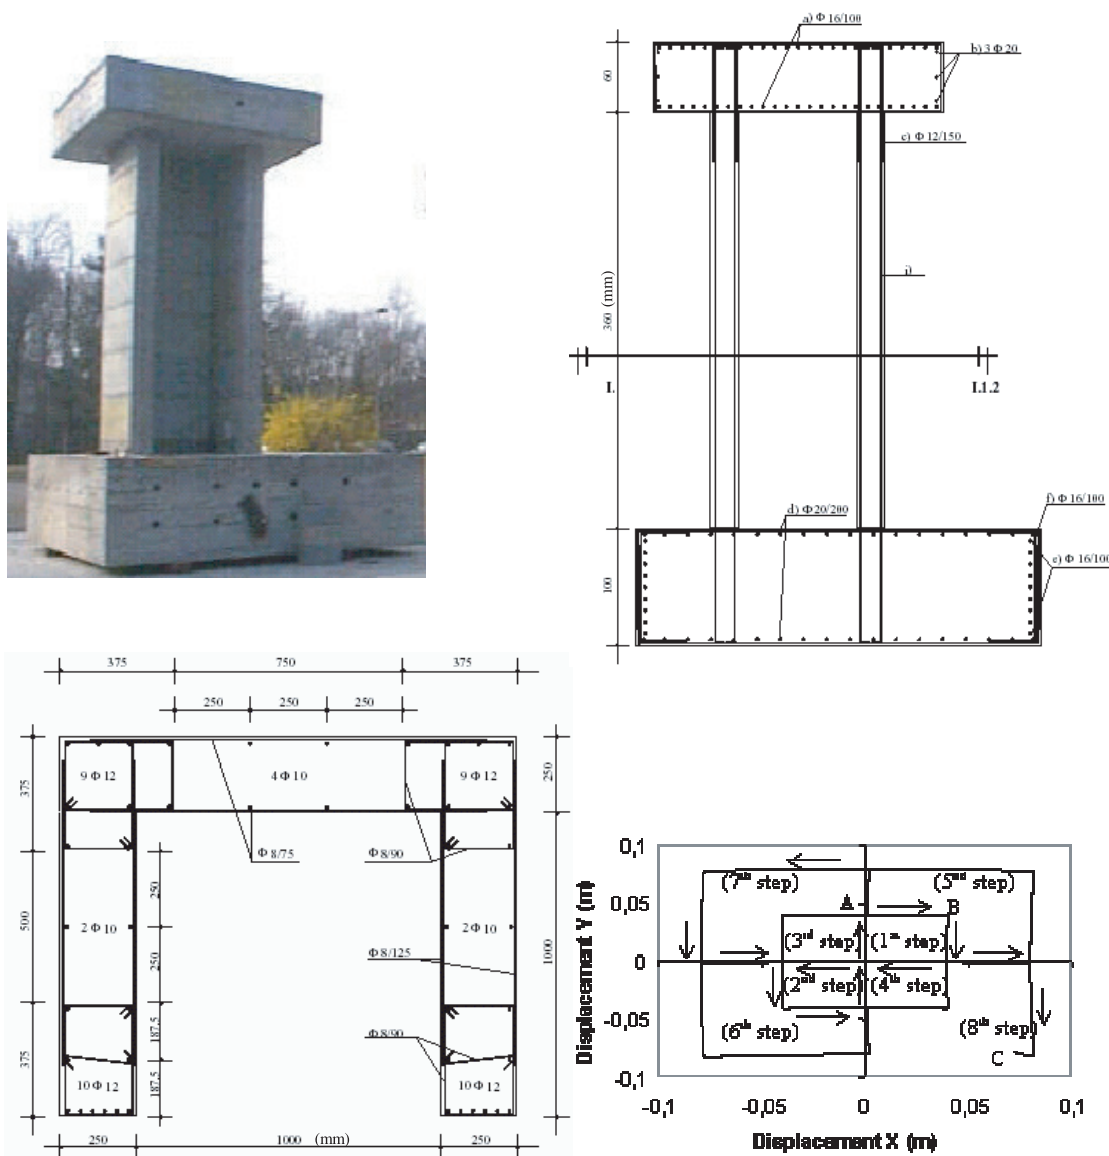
U-shaped wall — Description of the specimen and loading history.
